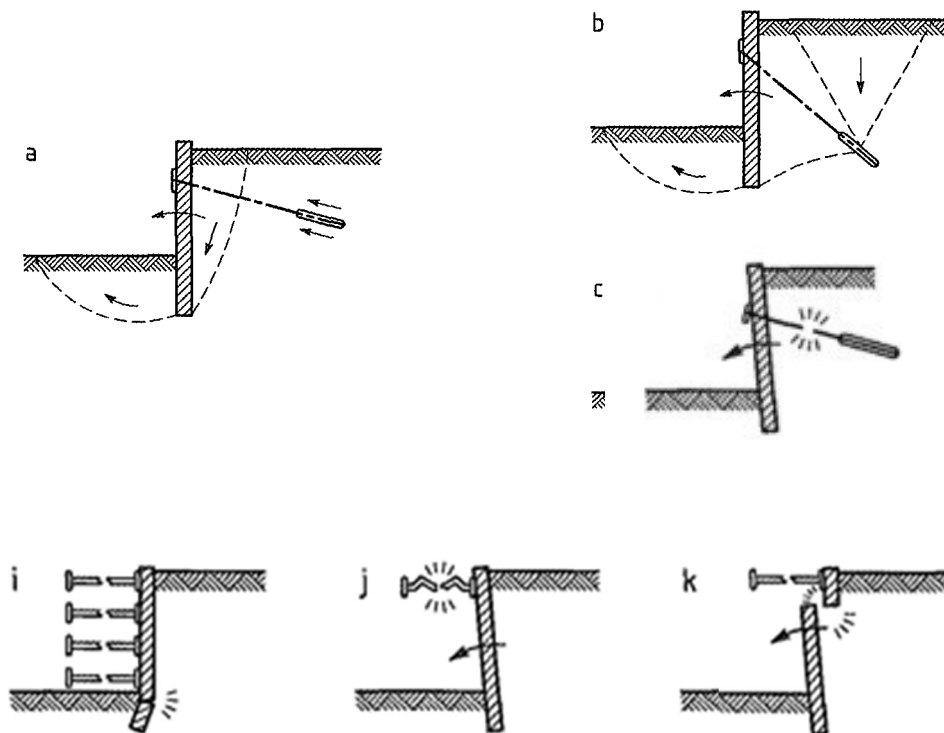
Examples of failures conditions for anchorage systems (anchors and struts - from Eurocodes 7)
